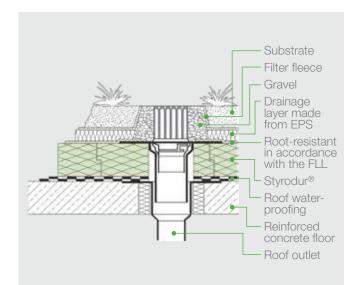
Roof outlet of an inverted green roof with EPS drainage boards.
